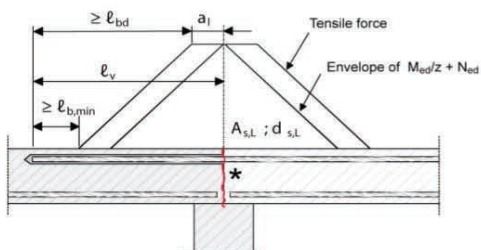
Overlap joint in foundation of a column or wall where the rebars are stressed in tension.
